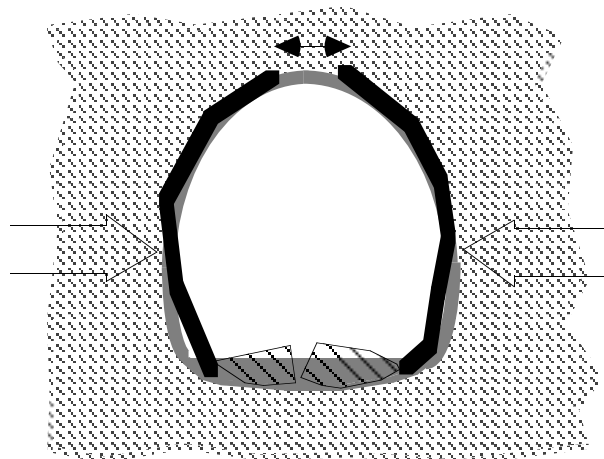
Distorted shape and buckling of pavement in Haguro Tunnel, Niigata-Chuetsu
